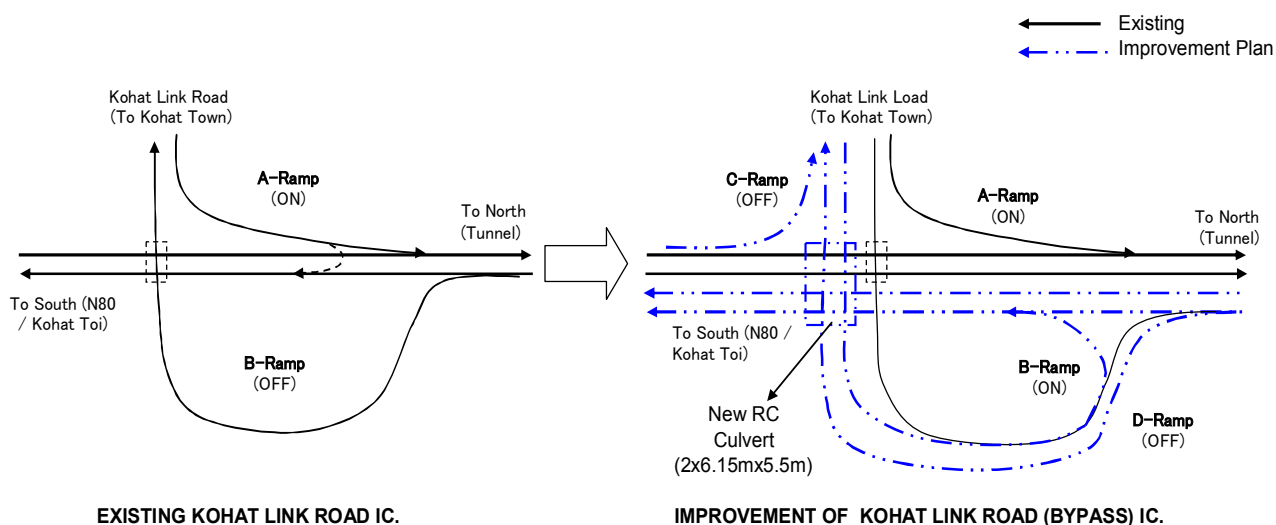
Kohat Link Road IC Improvement Plan
